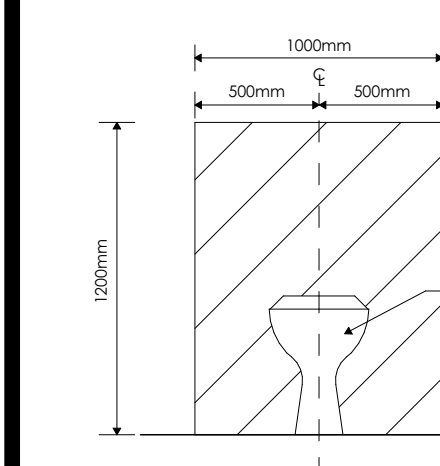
BELOW LOCATION OF SHEETING FOR A WALL BEHIND A TOILET PAN
